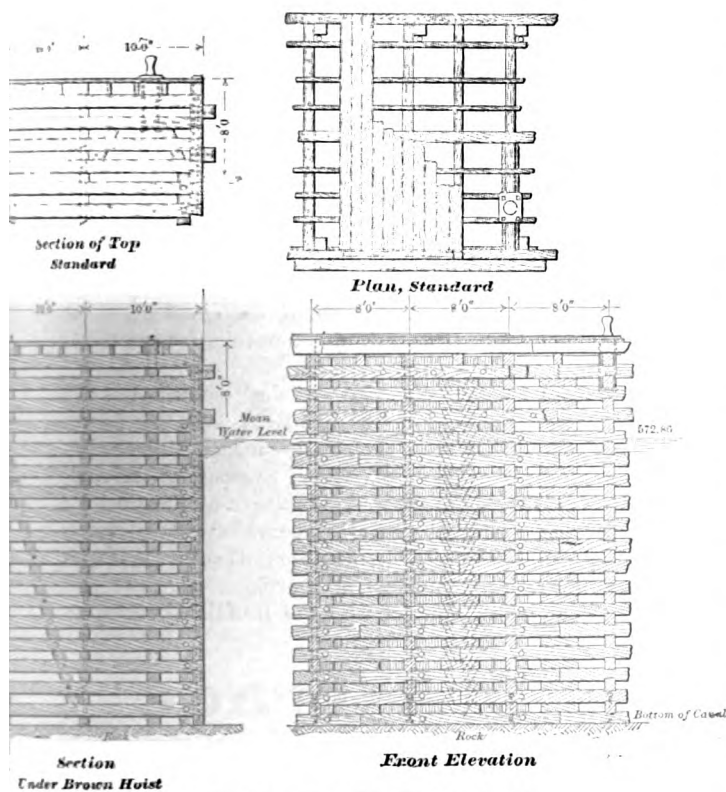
DETAILS OF DOCK CONSTRUCTION.
